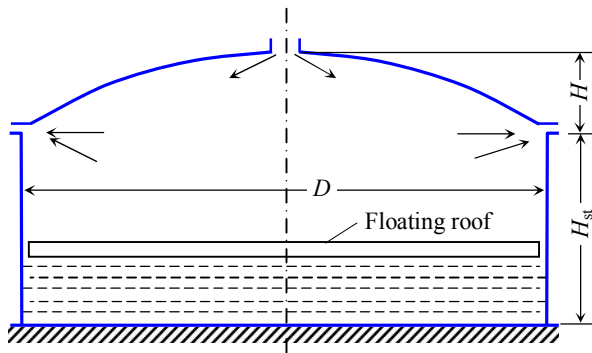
Gas space ventilation scheme of reservoir with internal floating roof
